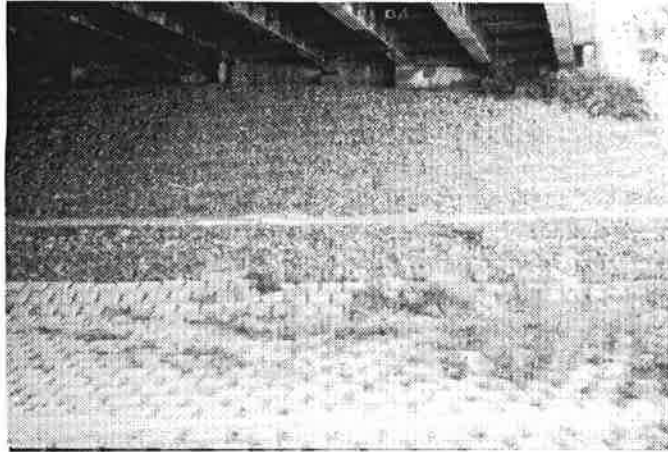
Shows cable tied blocks placed in channels underneath a multilane bridge.
